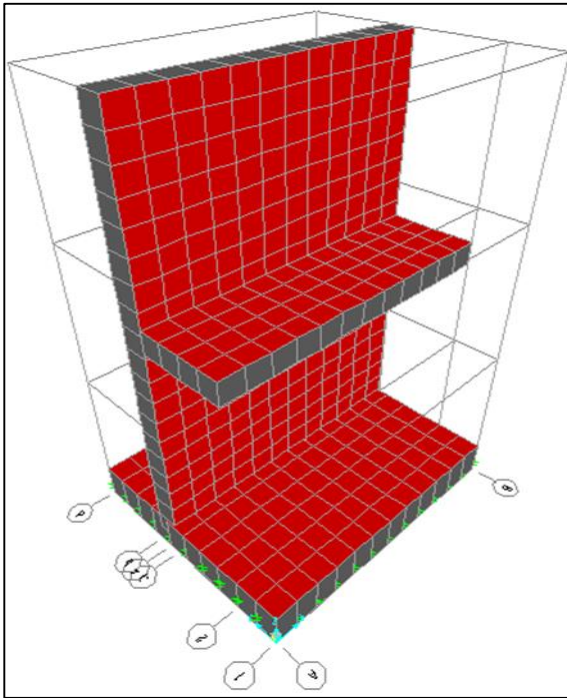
Schematic 3D Model of Cantilever retaining wall with shelf
